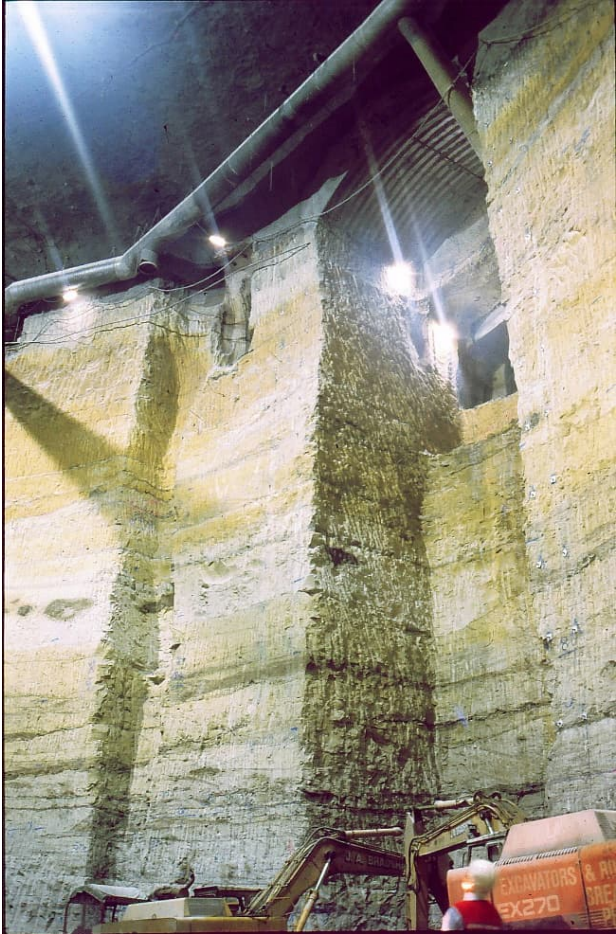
Near the base of the excavation, showing the sidewall slot that contains the lifts and stairs
